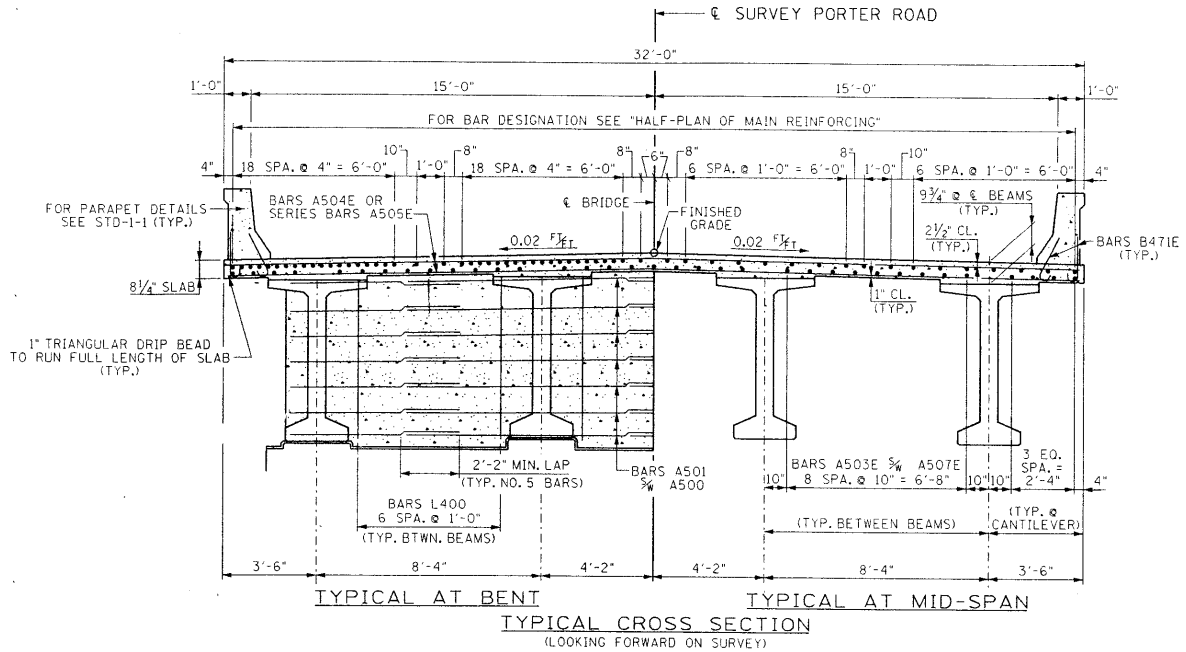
Cross-Sectional Details of Porter Road Bridge Superstructure
